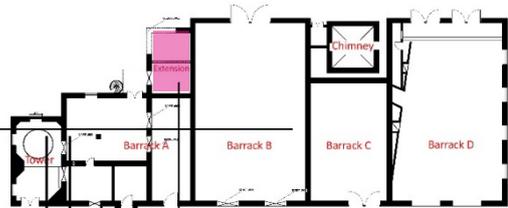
Plan - Prone to Rust, Roof Structure, Extension, Barrack A, 15 to 17A, East Wharf, KPT, Karachi.
